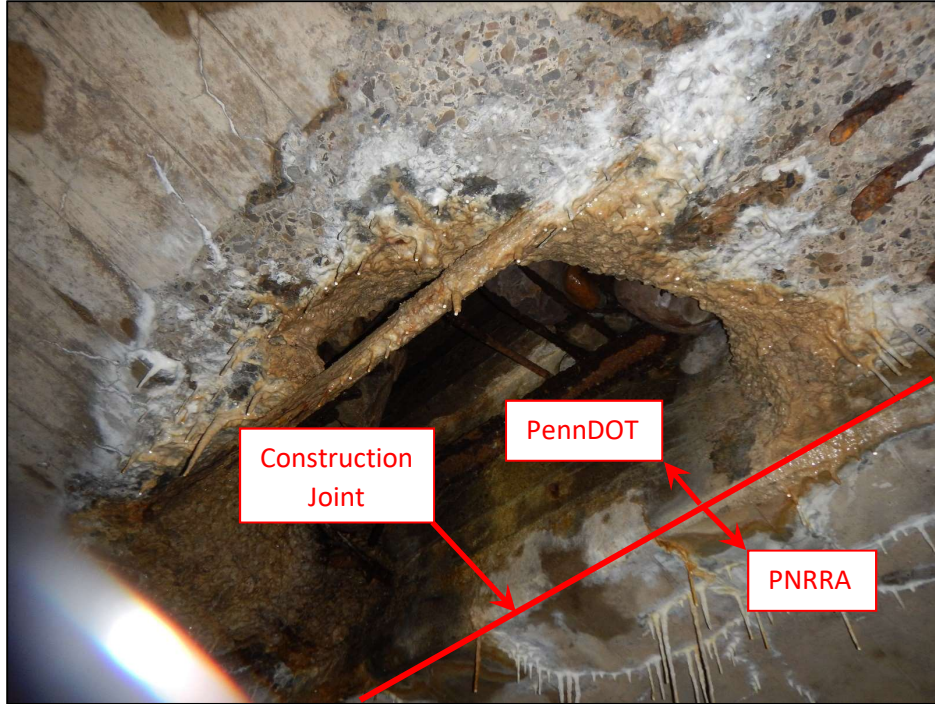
Heavily deteriorated drainage inlet through the top slab in Span 2 of the PennDOT section at the construction joint.
